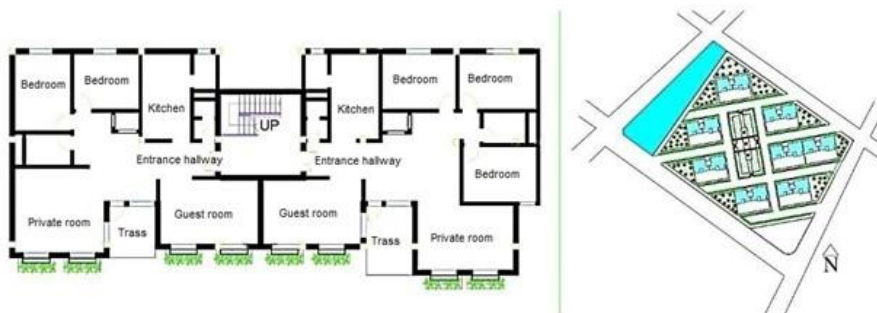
Design site (right), plan of three-bedroom and two-bedroom residential units (left)
